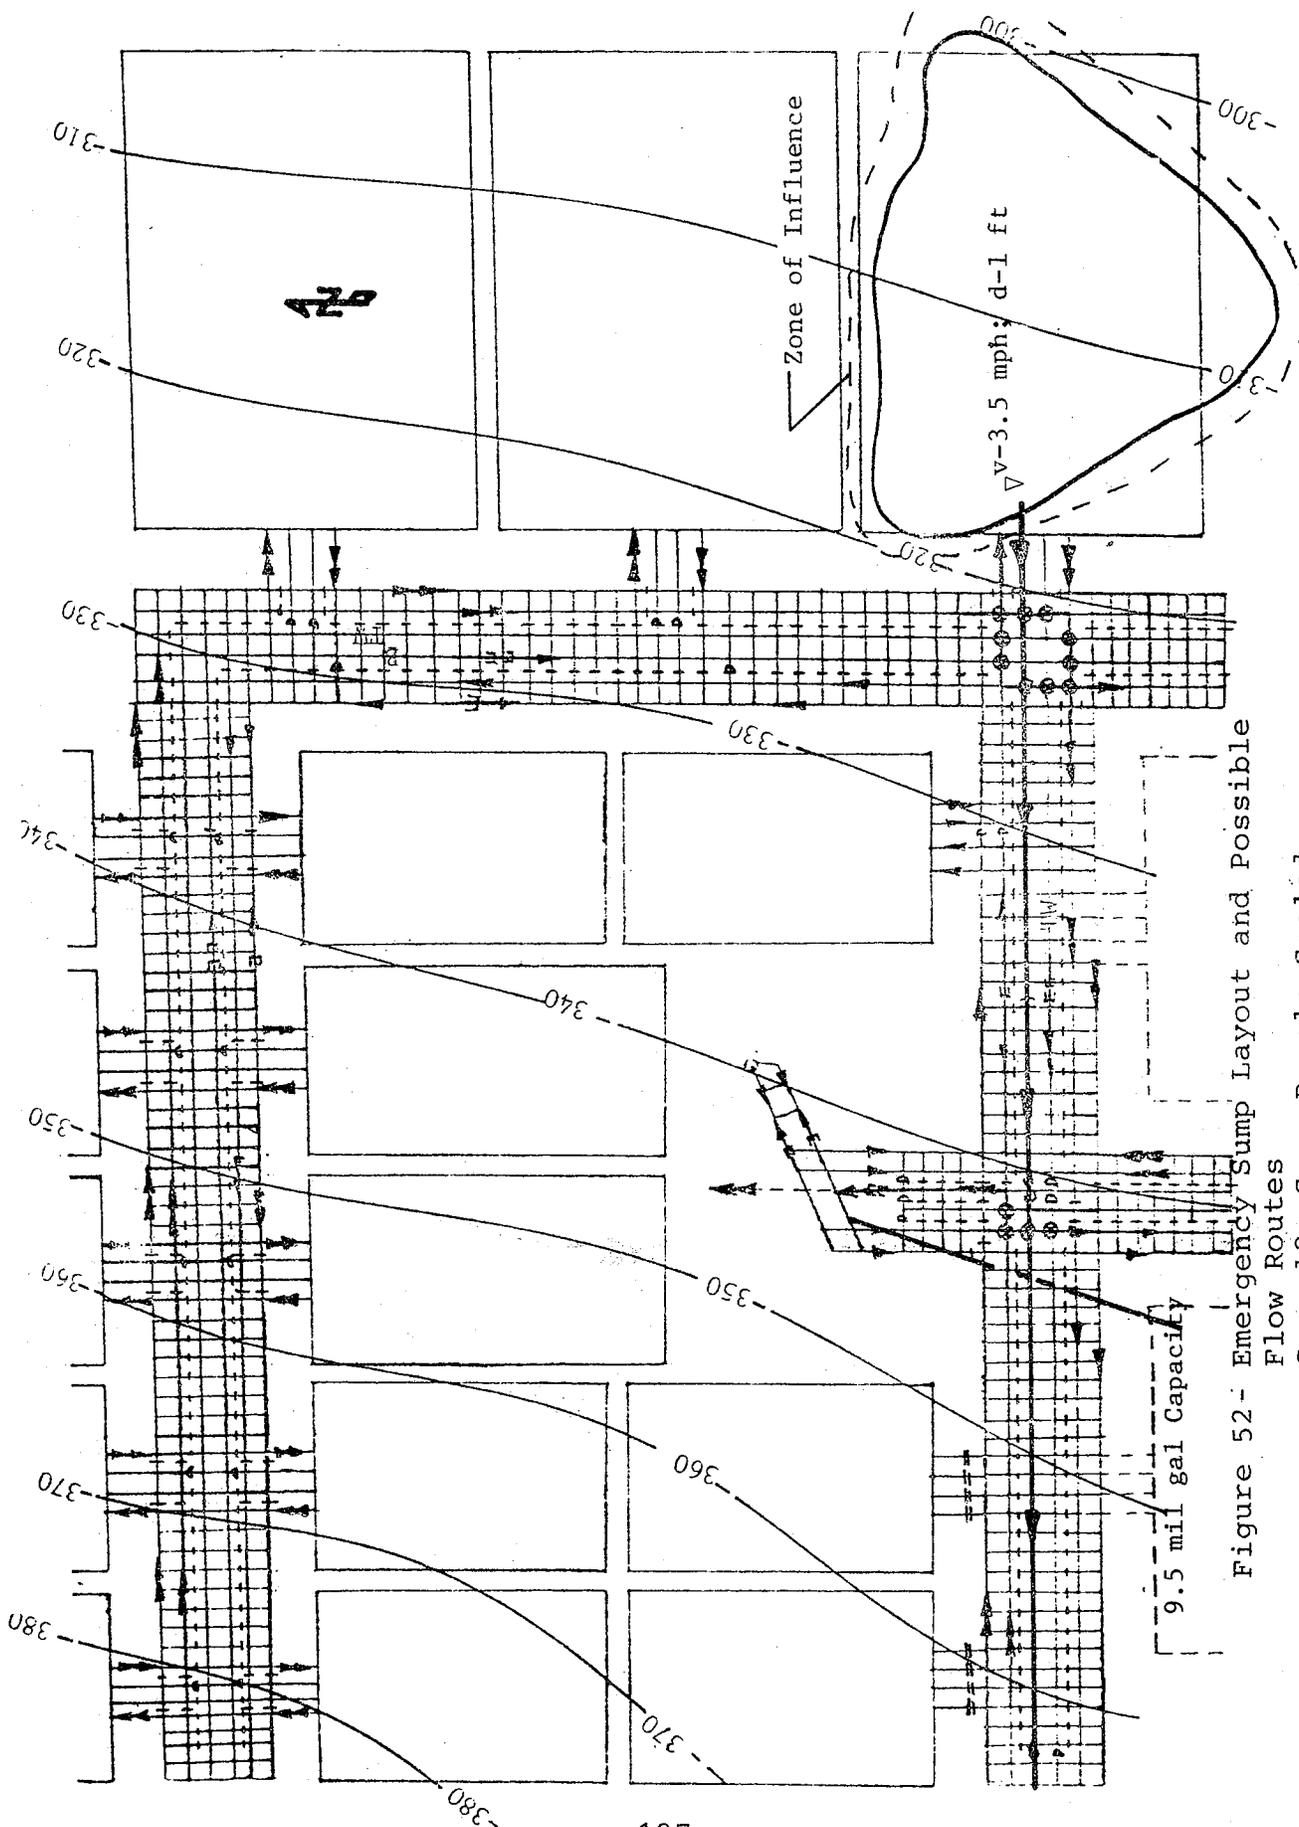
Emergency Sump Layout and Possible Flow Routes
